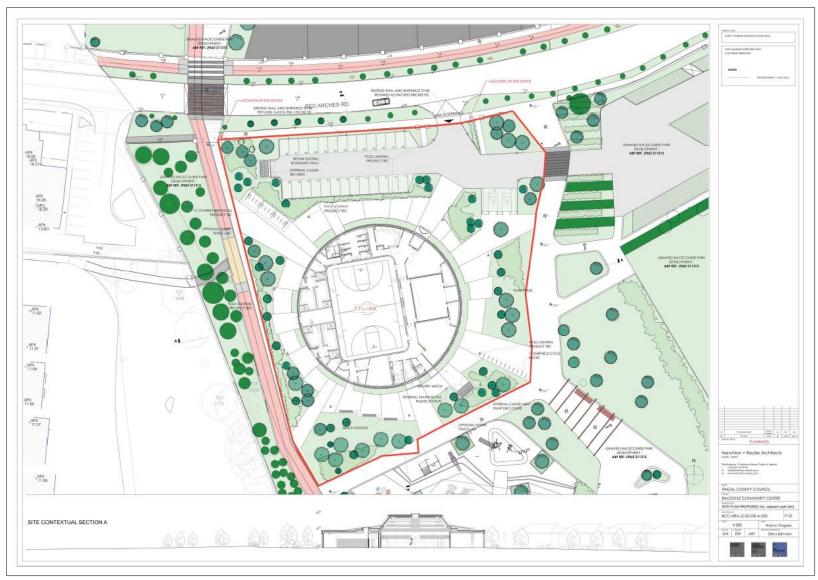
Site layout plan (Source: Henchion Reuters Architects, 2022).
